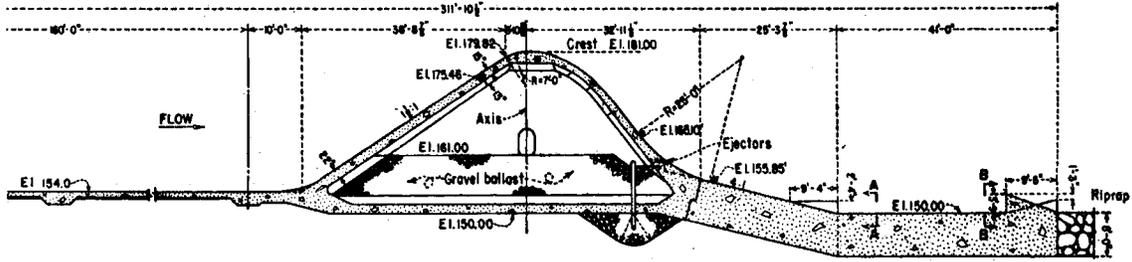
Typical section. The ejectors at elevation 159.6 feet are not displayed on many of the images in this report.
